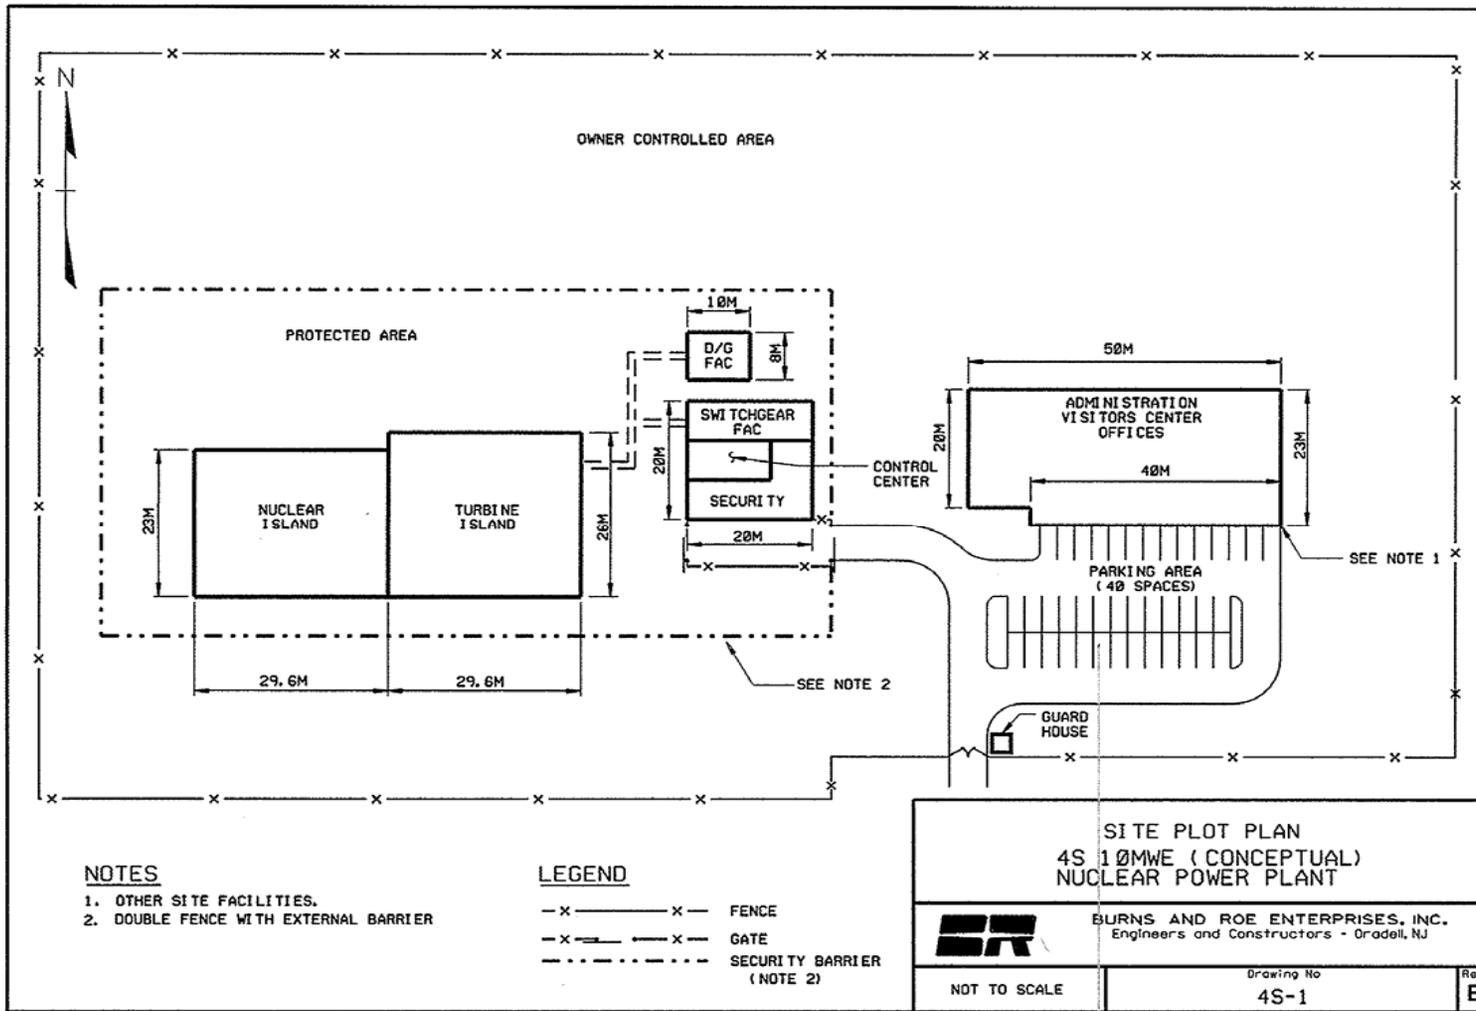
CONCEPTUAL PLANT LAYOUT
